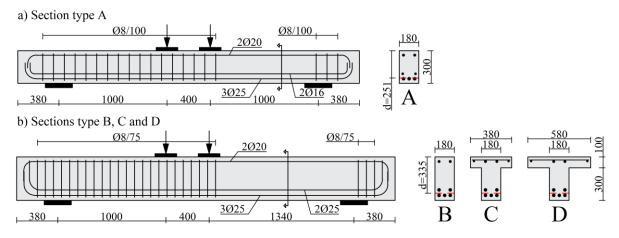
Geometry and reinforcement of the test specimens: a) specimens with section type A; b) specimens with sections type B, C and D (units: mm).
